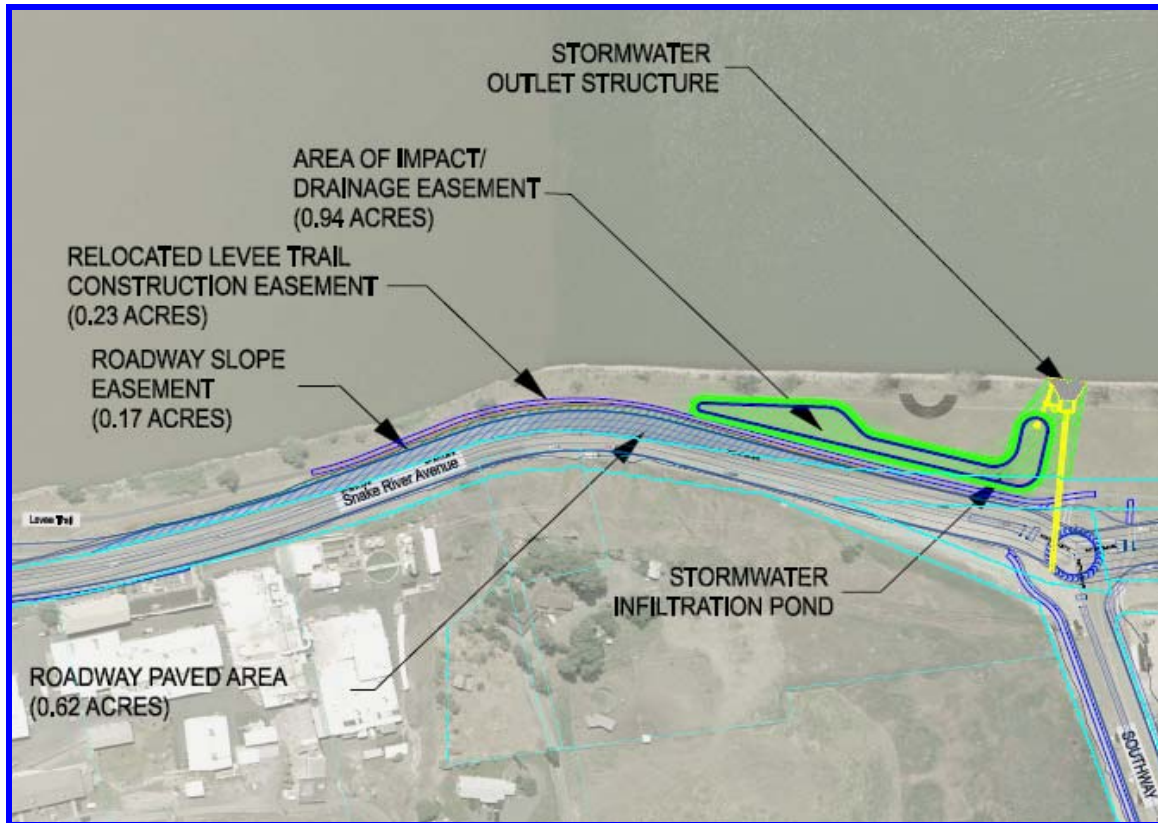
Proposed Storm Drain Improvements (Southway)
